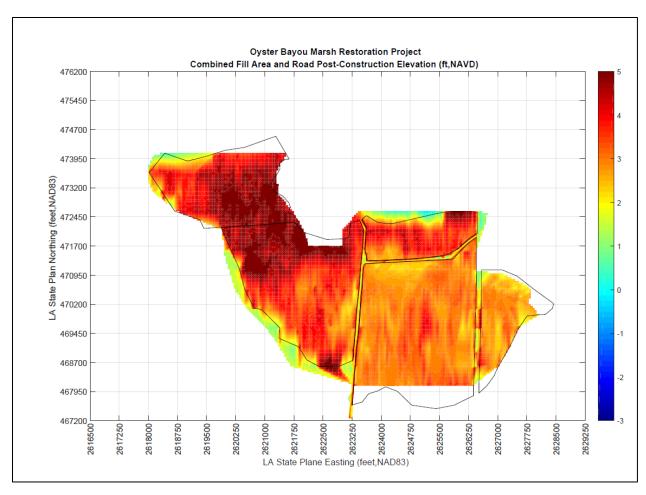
Plan View of Elevations Constructed within MCA 1-5A.
